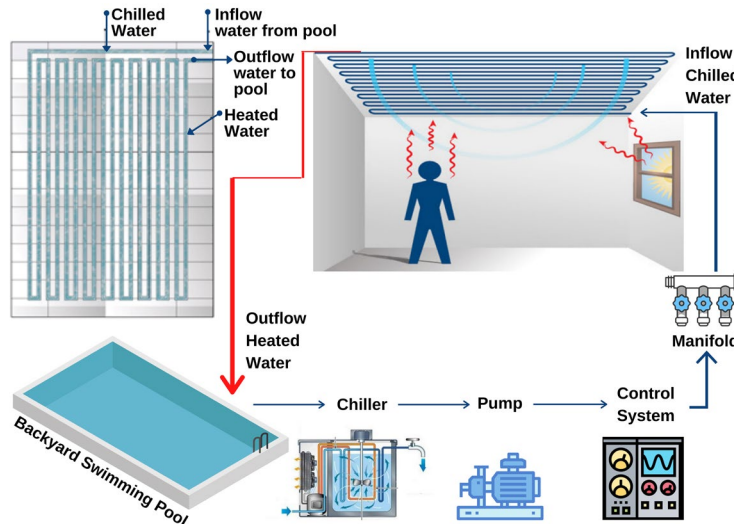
Possible ceiling radiant cooling panel layout for a 41.25 m^2 room
